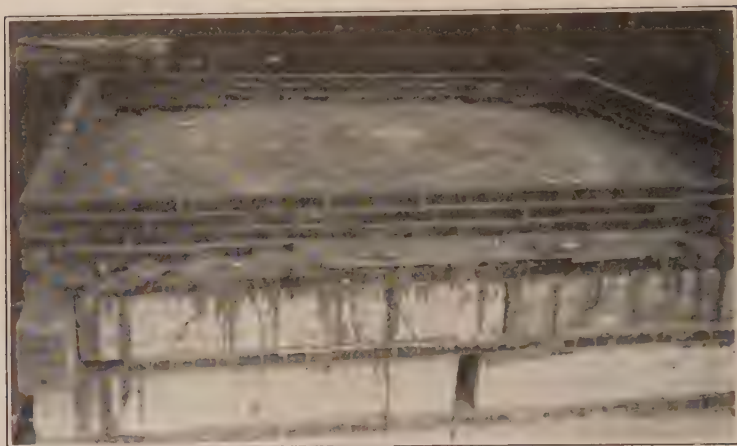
VIEW OF DOME BEFORE CINDER CONCRETE FILL HAD BEEN PLACED
